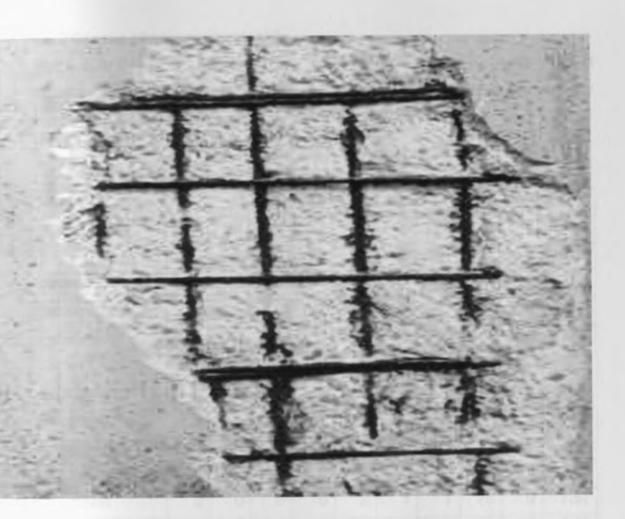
Inadequate concrete cover over the steel reinforcement has caused the steel to corrode. As it expands it causes the concrete to crack and spall.
